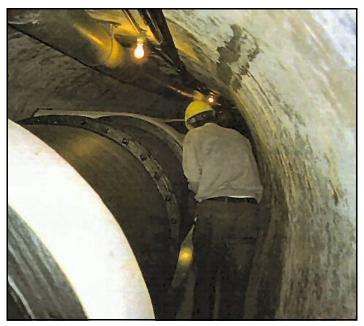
A steel pipe is located within a larger downstream access conduit.
